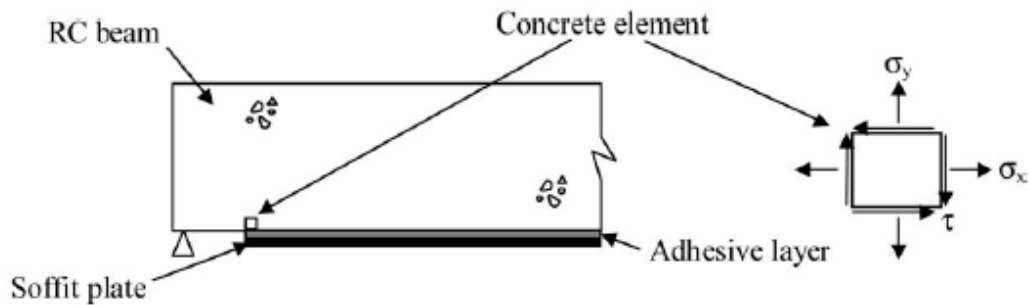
Stresses acting on a concrete element adjacent to the plate end
